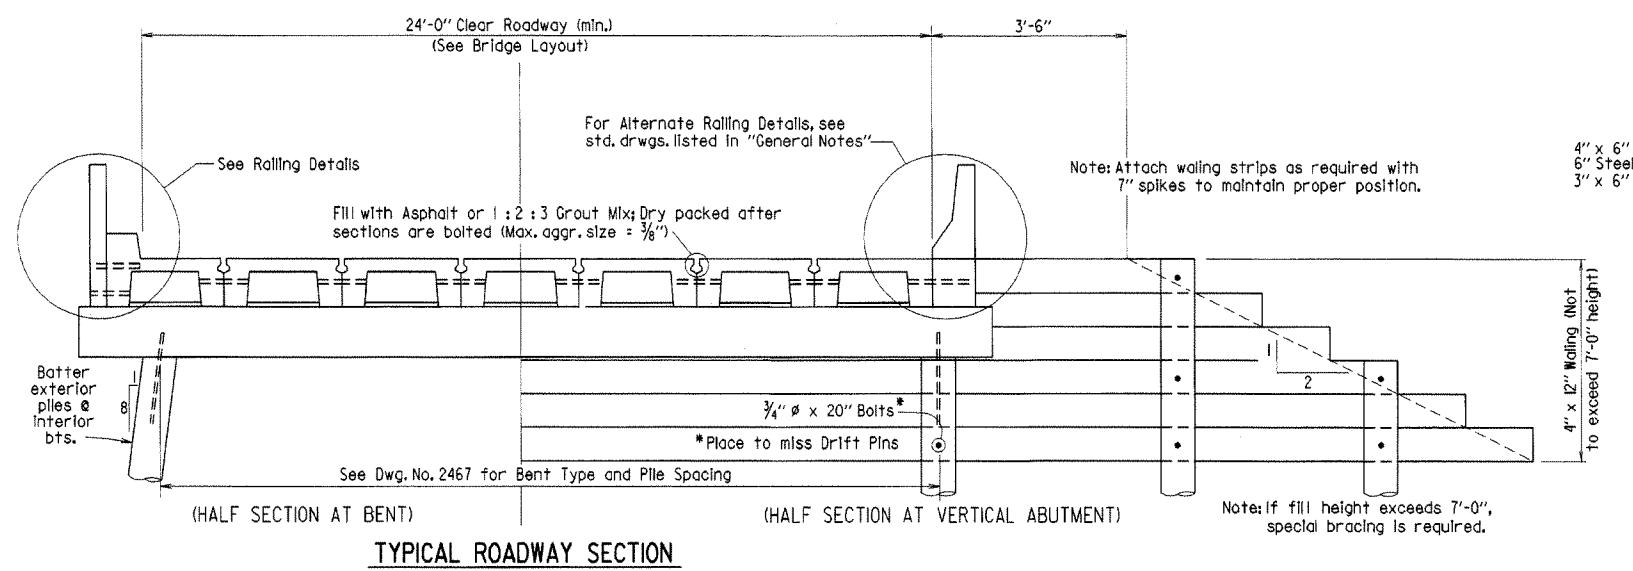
DETAILS OF STANDARD TEMPORARY BRIDGE STRUCTURE BRIDGE END PROTECTION SYSTEM
